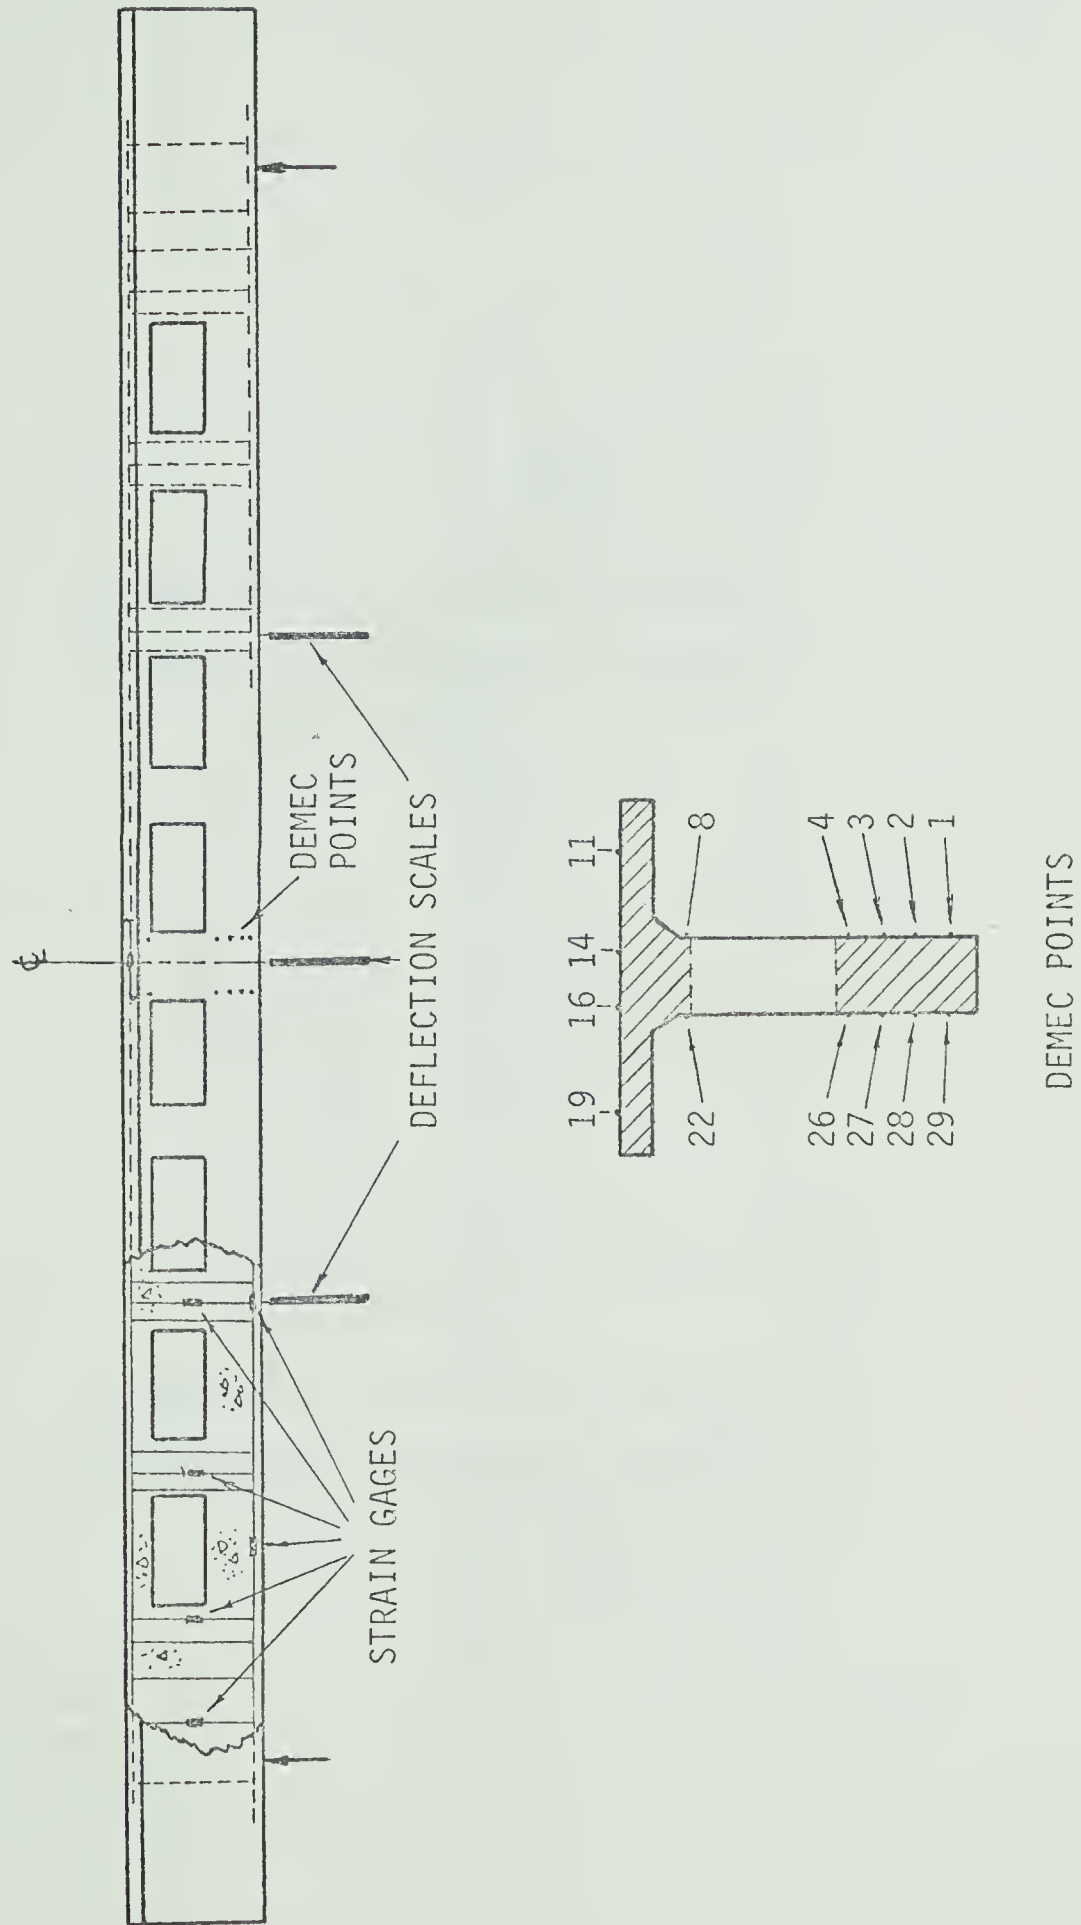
BEAM INSTRUMENTATION DETAILS AND LOCATIONS
